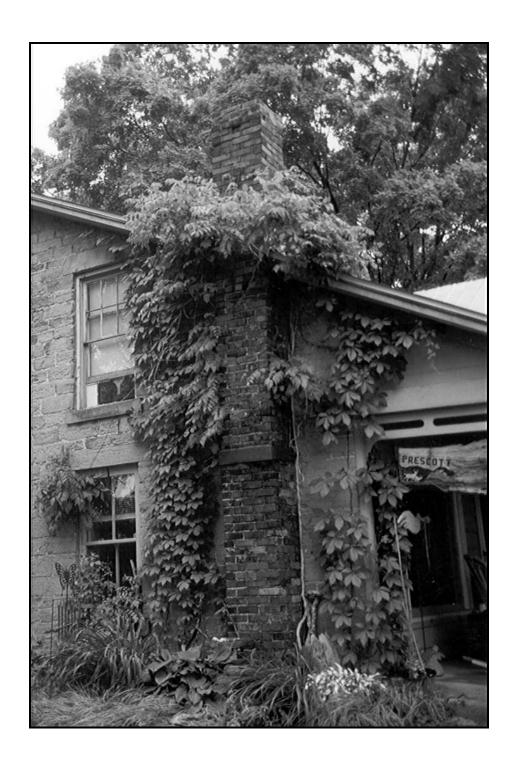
Photograph of the northwest corner of the north wing, showing the exterior brick chimney that vents the boiler currently used to heat the house. A hot-water heating system was installed in the house during the early twentieth century (FRR June 2001).
